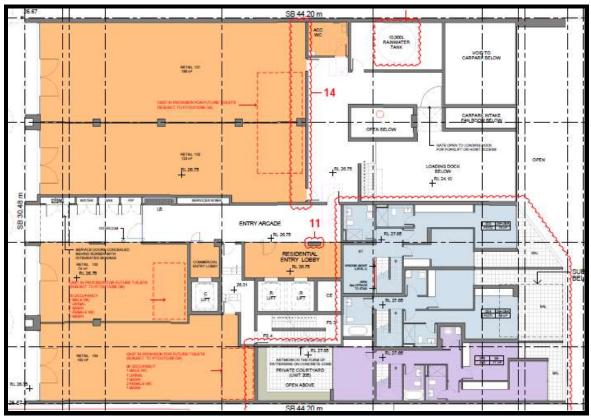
Layout of Level 1 floor plan as approved by MOD2020/0148
